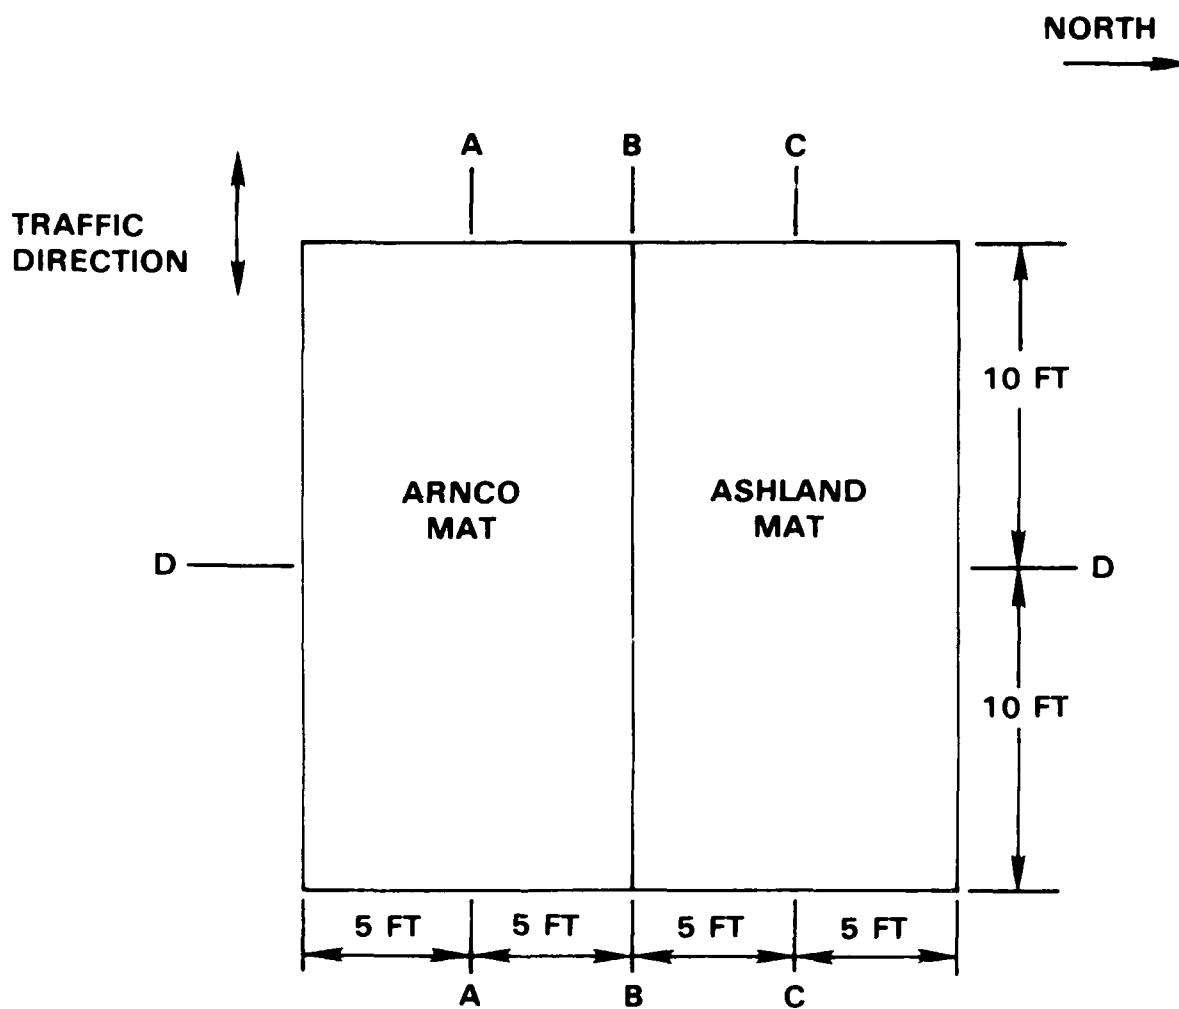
Test Section Plan View, Alternative Polyurethane Fiberglass Mat.
